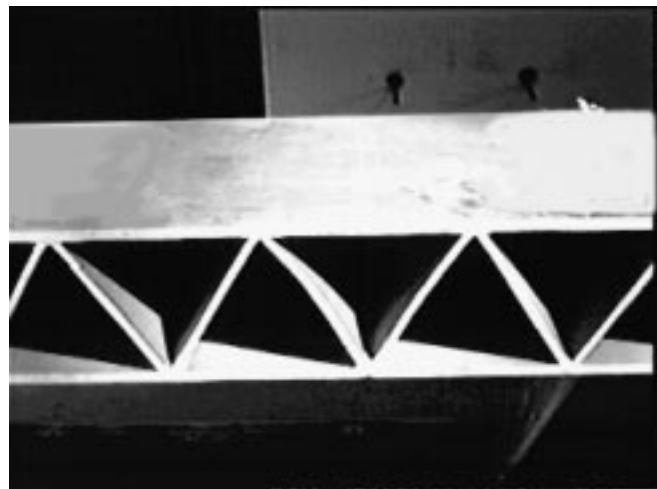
Early Prototype Truss Structure Built by Hardcore DuPont and Tested at UCSD [author photo]
